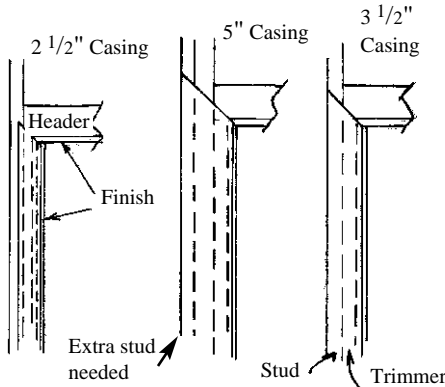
Adding an extra stud next to the door frame to provide nailing for the outside edge of the casing
